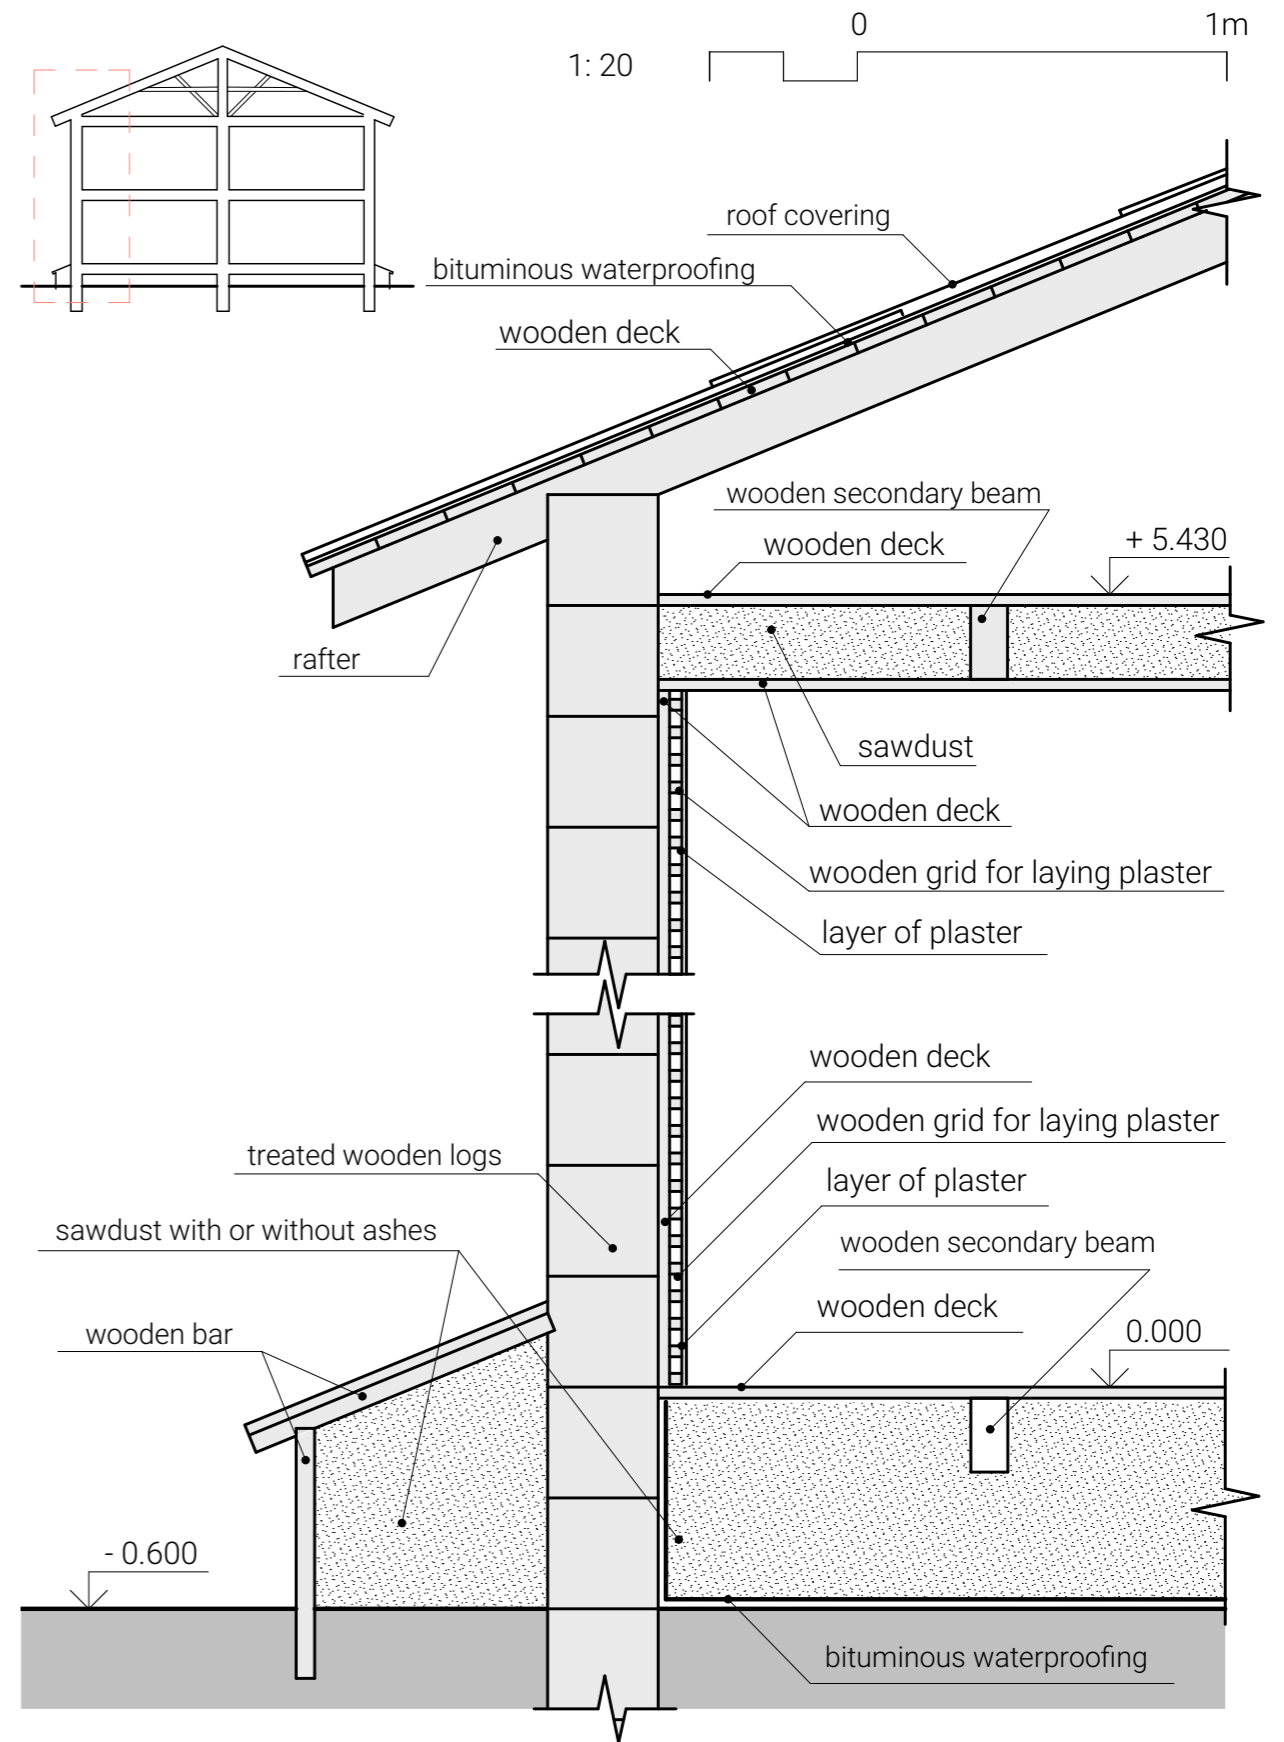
A section of the two-floor wooden house construction (made by Maria Lozitskaya based on written sources and drawings)
